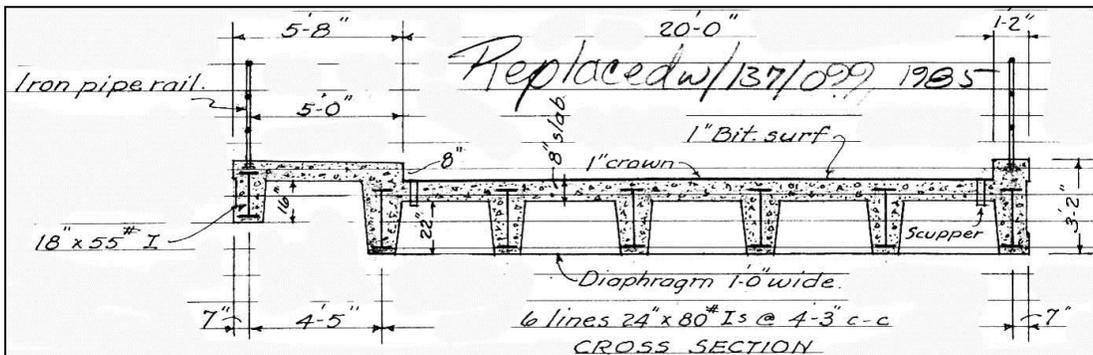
Elm Street Bridge, Newport (1916). Section sketch showing concrete encased I-beams, an inefficient and short lived bridge type that was incorrectly identified in bridge records as a concrete T-beam bridge (NHHD Bridge Inventory Card).
